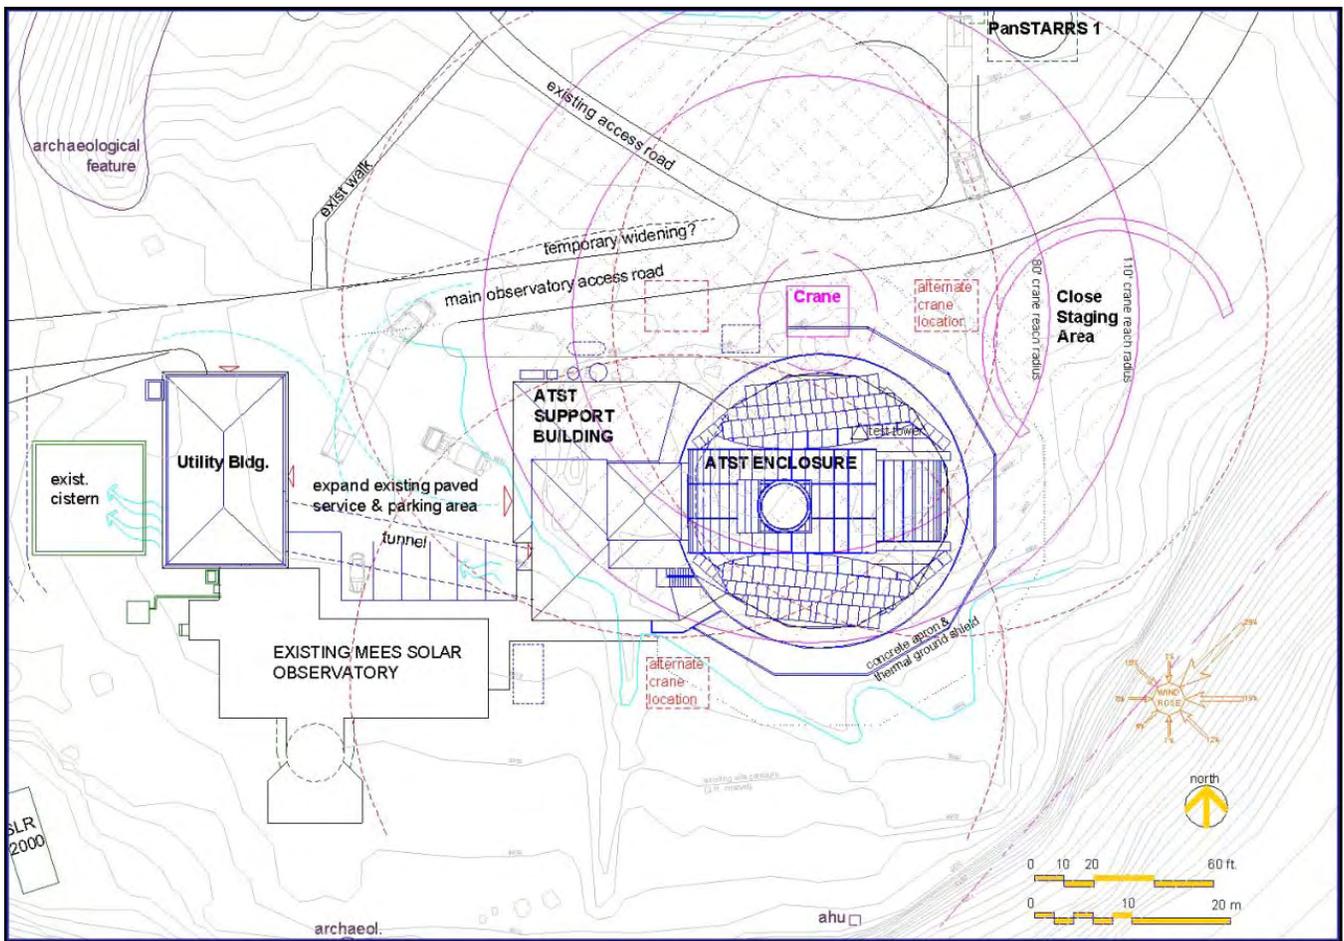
Staging Area in Close Proximity to Proposed Construction Site.
